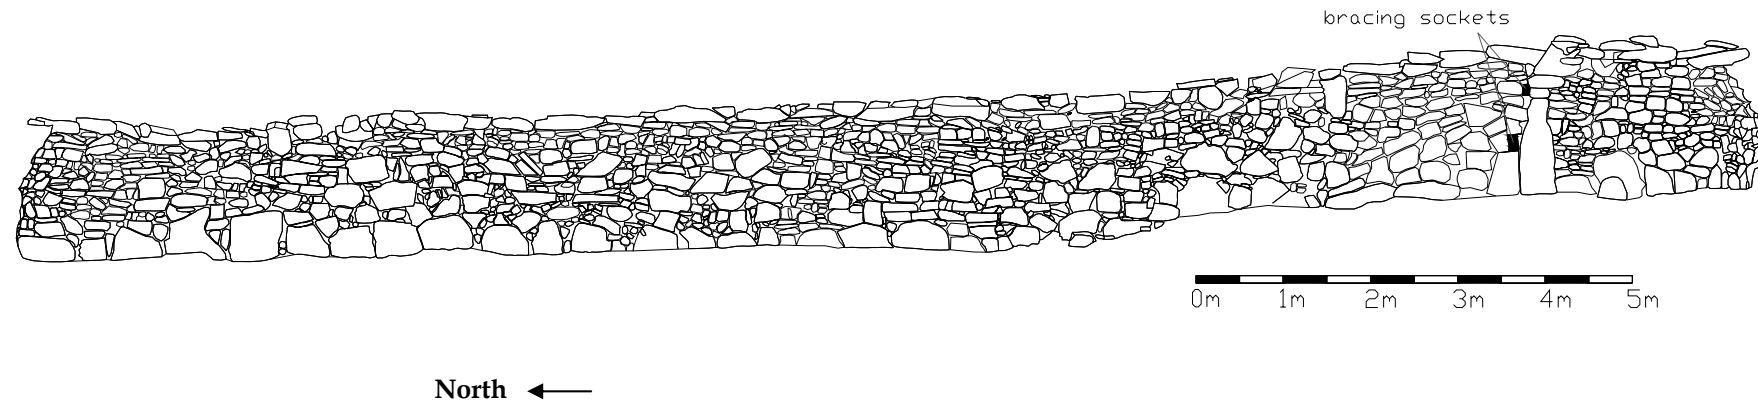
Elevation of Wall J, east wall of gallery 4 with door jamb (Grid Point solutions with additions)
